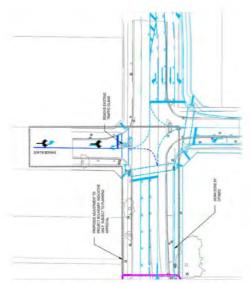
PREFFERED SHANDEAU AVENUE/CLAYTON ROAD/DIXON STREET INTERSECTION LAYOUT
